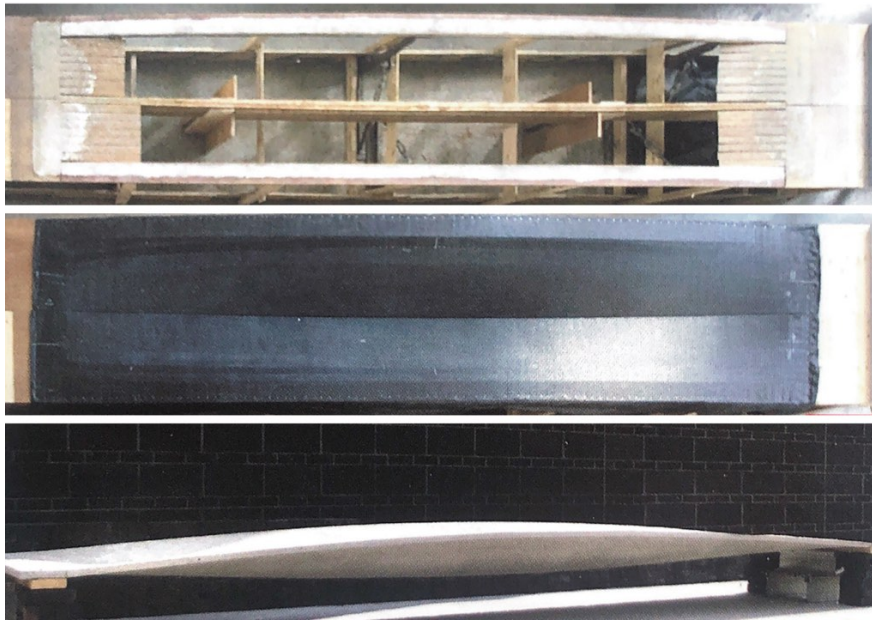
Thin concrete vault built using a tensioned fabric on a timber rig (West, 2016).
